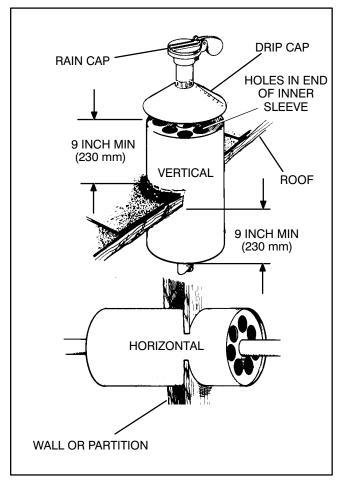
MOUNTING EXHAUST THIMBLE
